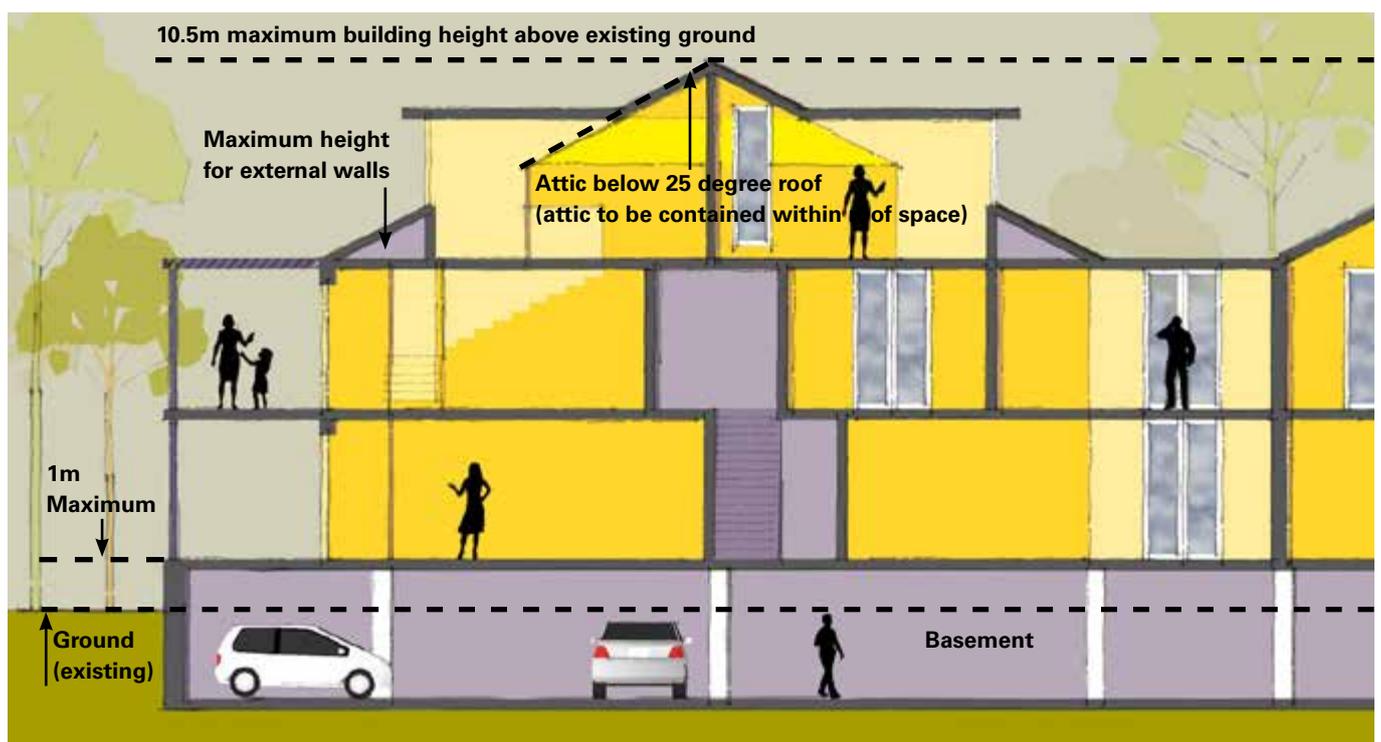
(e): Building Height Controls - residential flat building of 2 storeys + attic. (l) Height controls are based on a typical residential floor to floor height of 3 metres, with a 3.5 metre allowance for roof articulation and a 1 metre basement projection.
